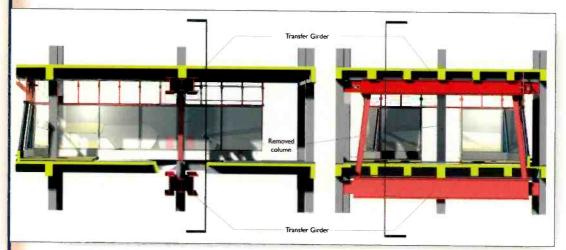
To remove a conspicuous column from the studio area, the design team added two columns in the plane of the studio's sloping glass wall, connected by 36-inch transfer girders to keep the cavity space free of structural members. Two 52-inch girders brought the structural loads back to their original footing on the concourse level.
